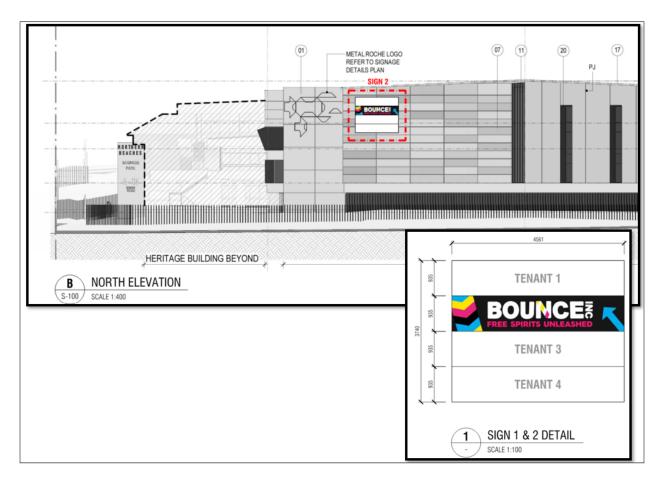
South Creek Road Elevation - Signage 2 (Source: 2M Creative, 2023)
